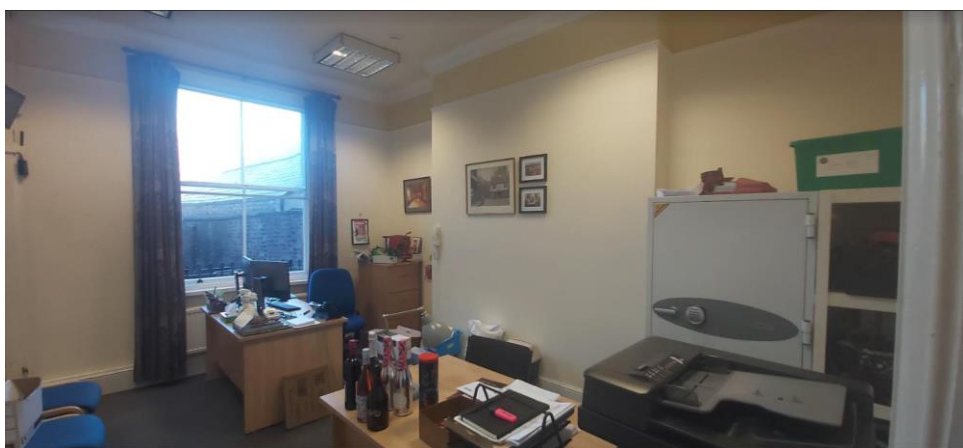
Missing fireplace to ground floor, rear room to be reinstated
